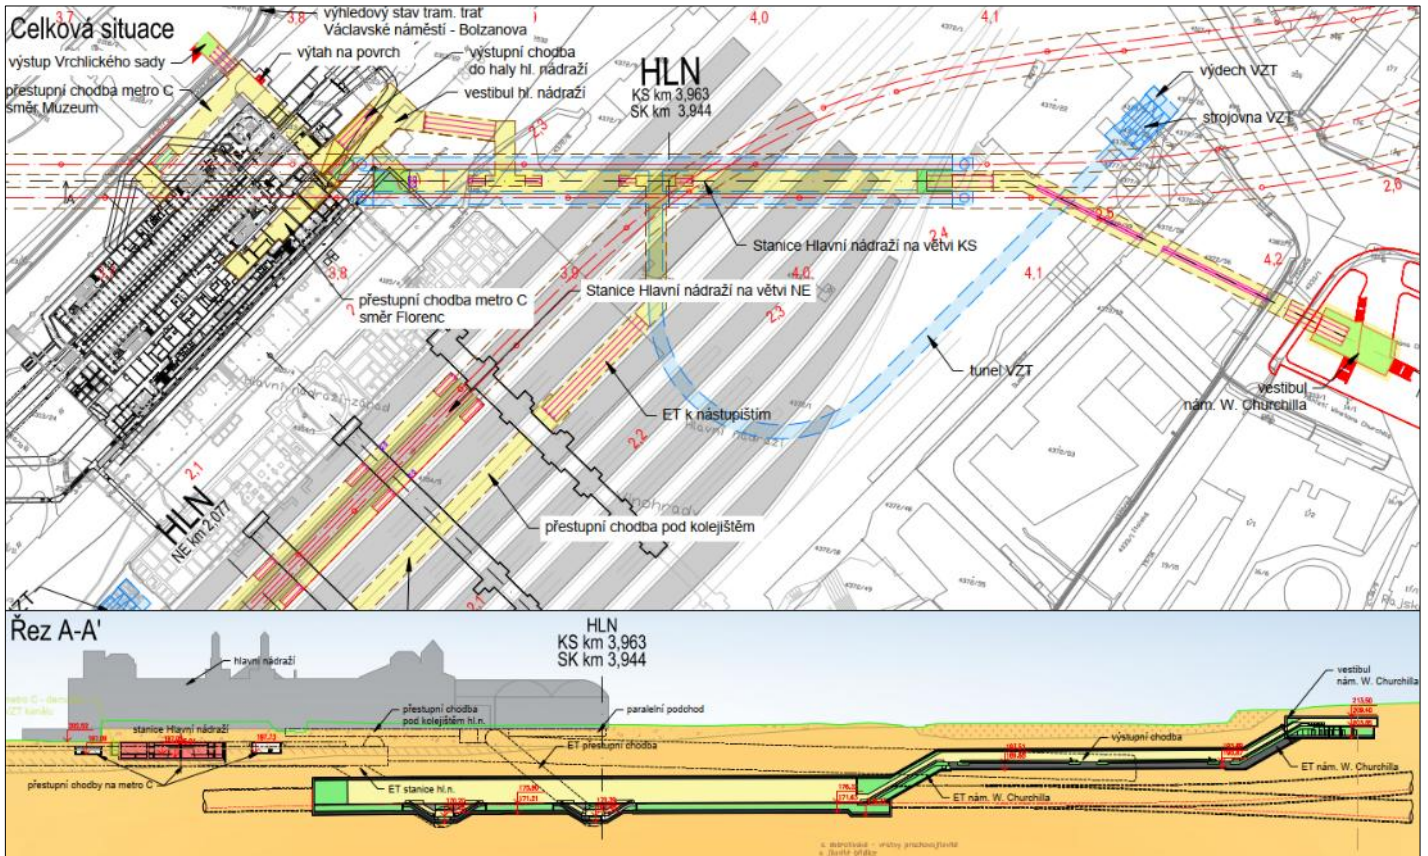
Layout and longitudinal plan of lower station at Prague Main Station hub. Source: Mott Mac Donald CZ, spol. s.r.o.
